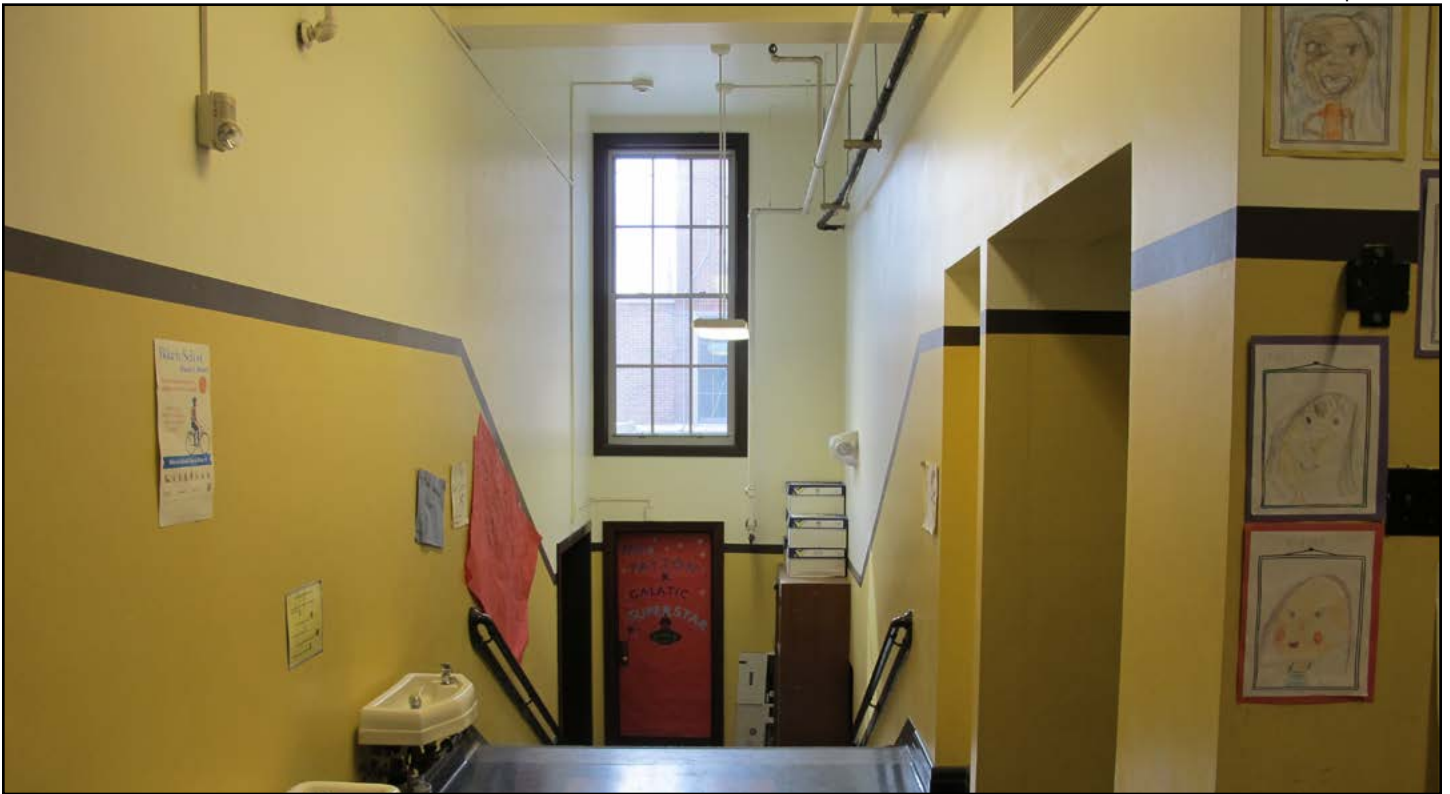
Loyal Heights Elementary School, stair from main floor to playground
